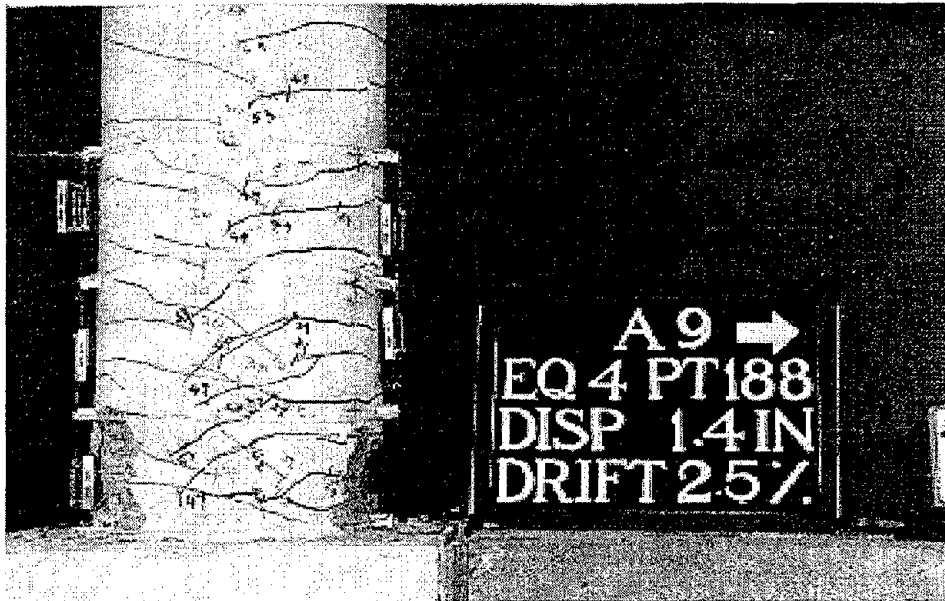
Damage to Specimen A9 at end of Half-Cycle 188
